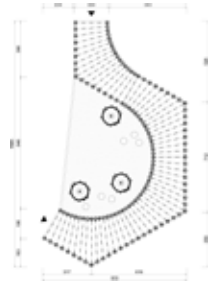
WUST Pavilion, version 2, plan view of the whole pavilion, 2014
